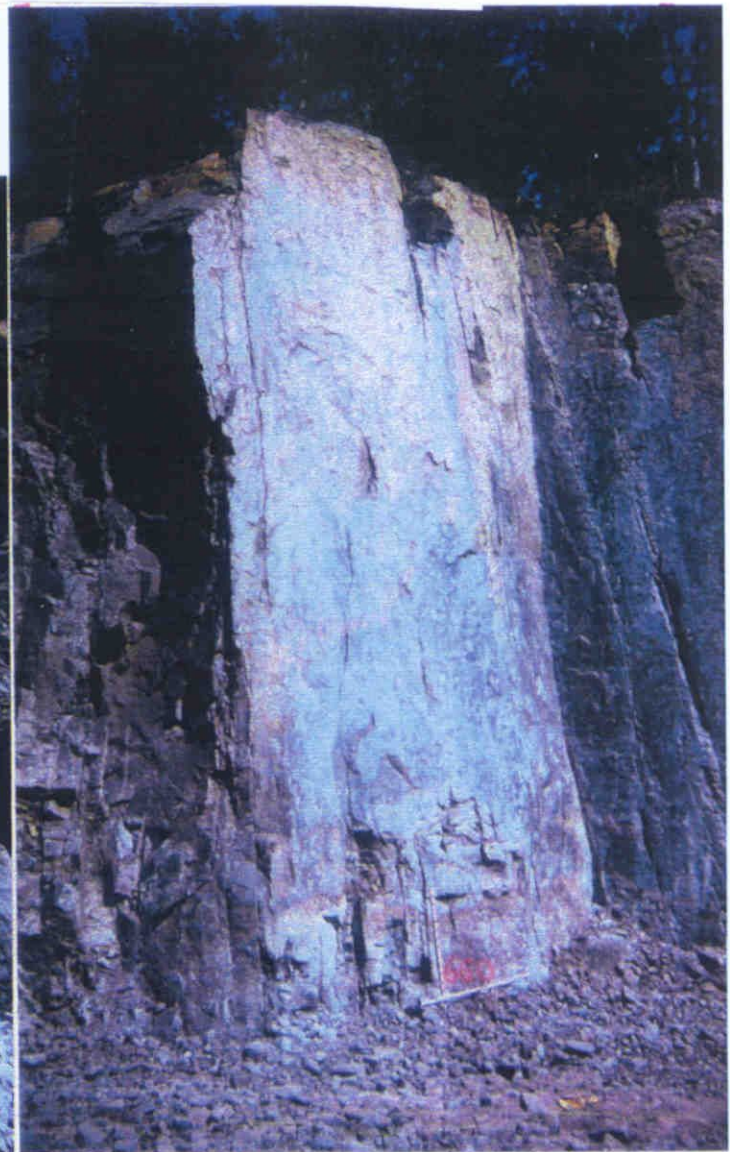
(Right) 16+620, Central Outcrop East side of Highway 11.
